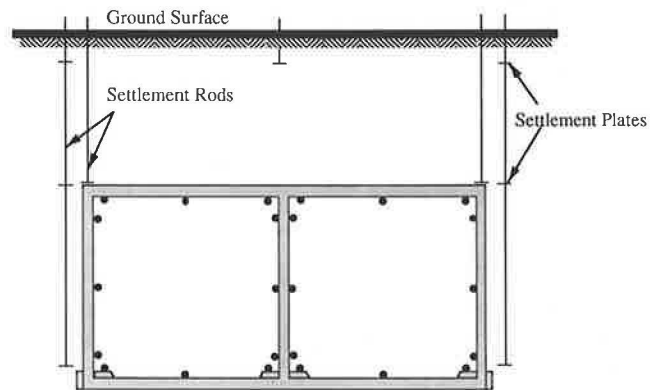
Cross section showing transverse deflection points and settlement plates (note: gauges were placed in pairs at midlength of culvert).
